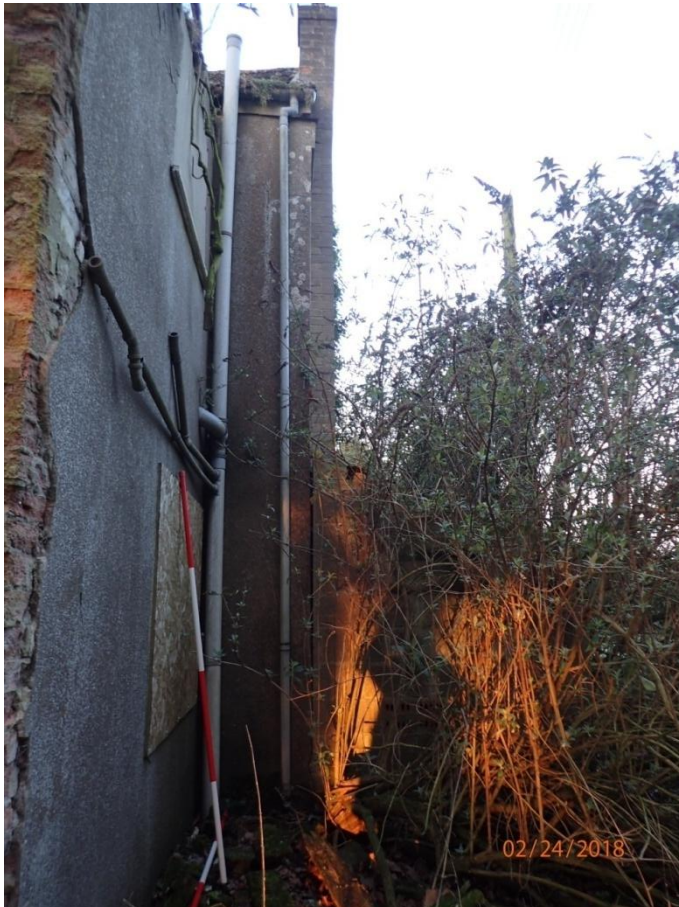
View of the East Elevation of a single storey rear outbuilding to the North Elevation and the East Elevation of the Rear Wing of the Farmhouse, from the east
